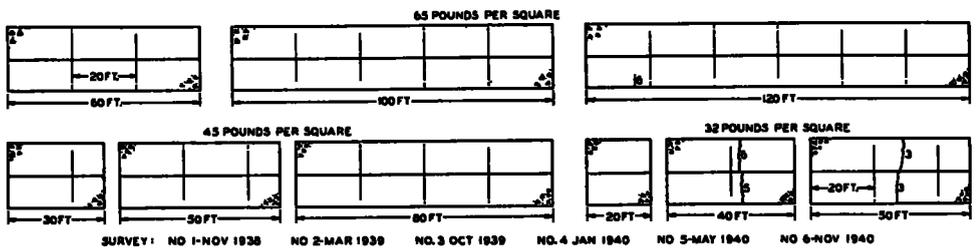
Typical crack survey sheet for short sections reinforced with welded fabric. Sections placed September-October 1938
